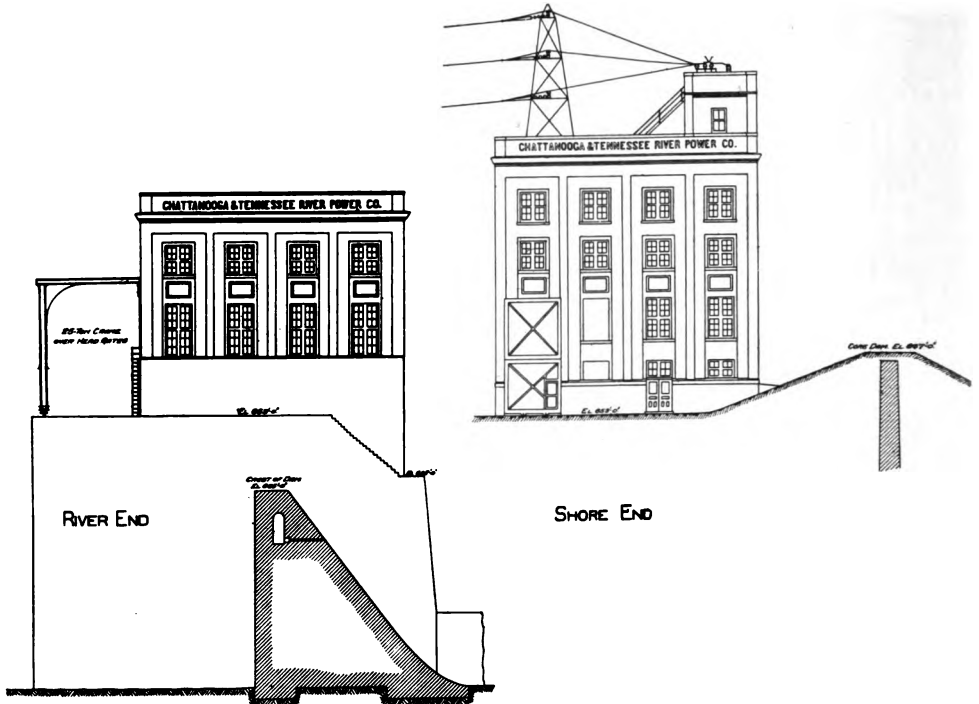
Elevations, Hales Bar Station, Chattahoochee & Tennessee River Power Co.
